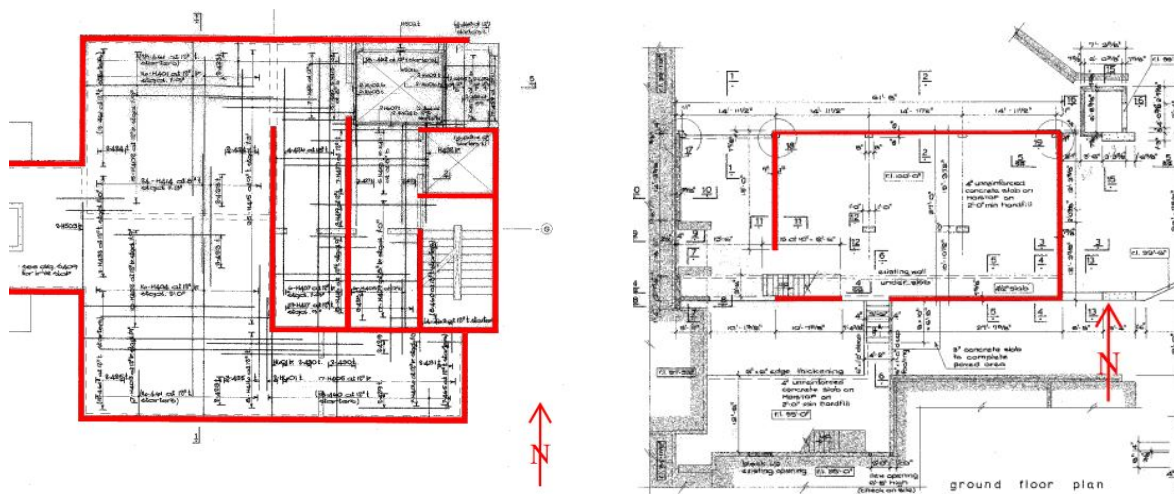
Kitchen (left) and 1976 Addition (right) Lateral Force-Resisting Systems
